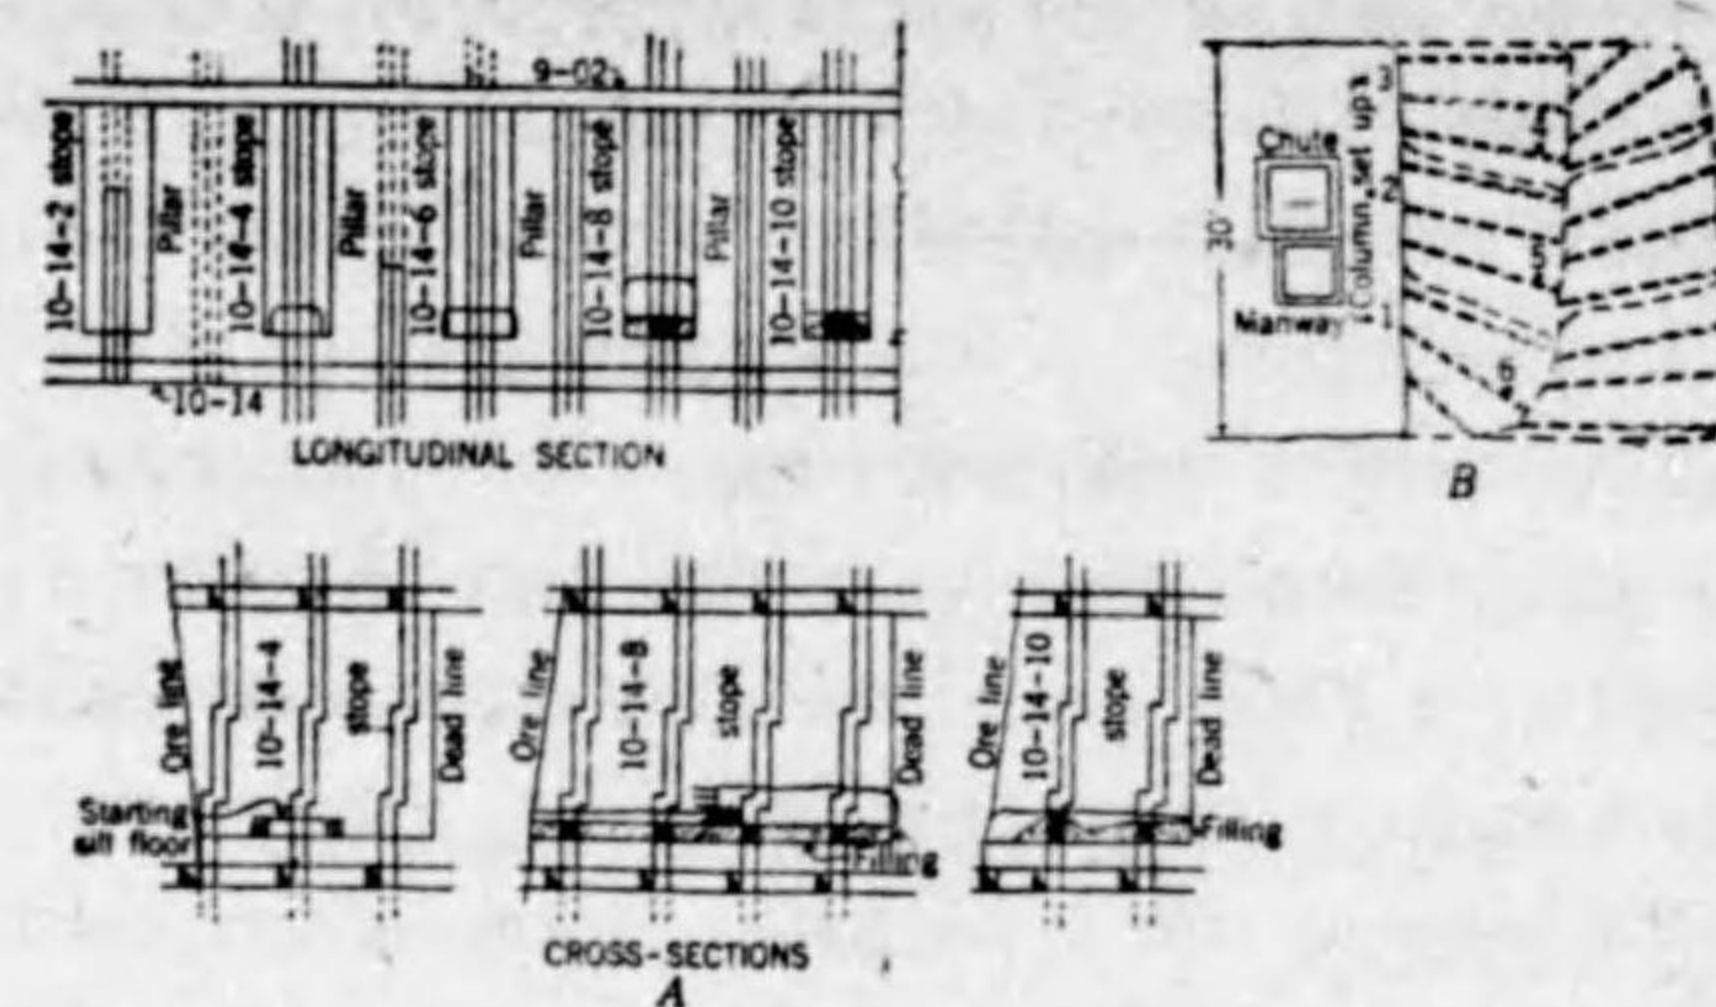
Horizontal cut-and-fill stoping, La Cololada mine; A, Vertical sections showing stoping system; B, Method of drilling holes for advancing sill cut.
